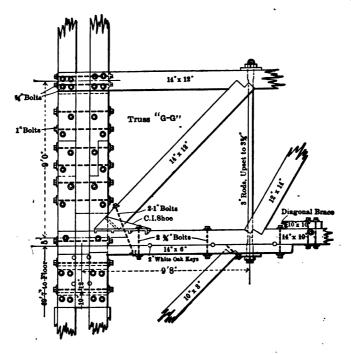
Howe Truss, Horticultural Building, Pan-American Exposition.
